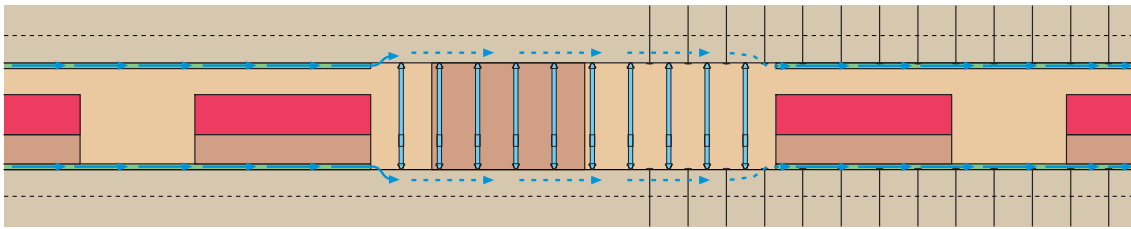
Alternative concept for disposal tunnels. The tunnel walls are stabilized by a cement liner.
